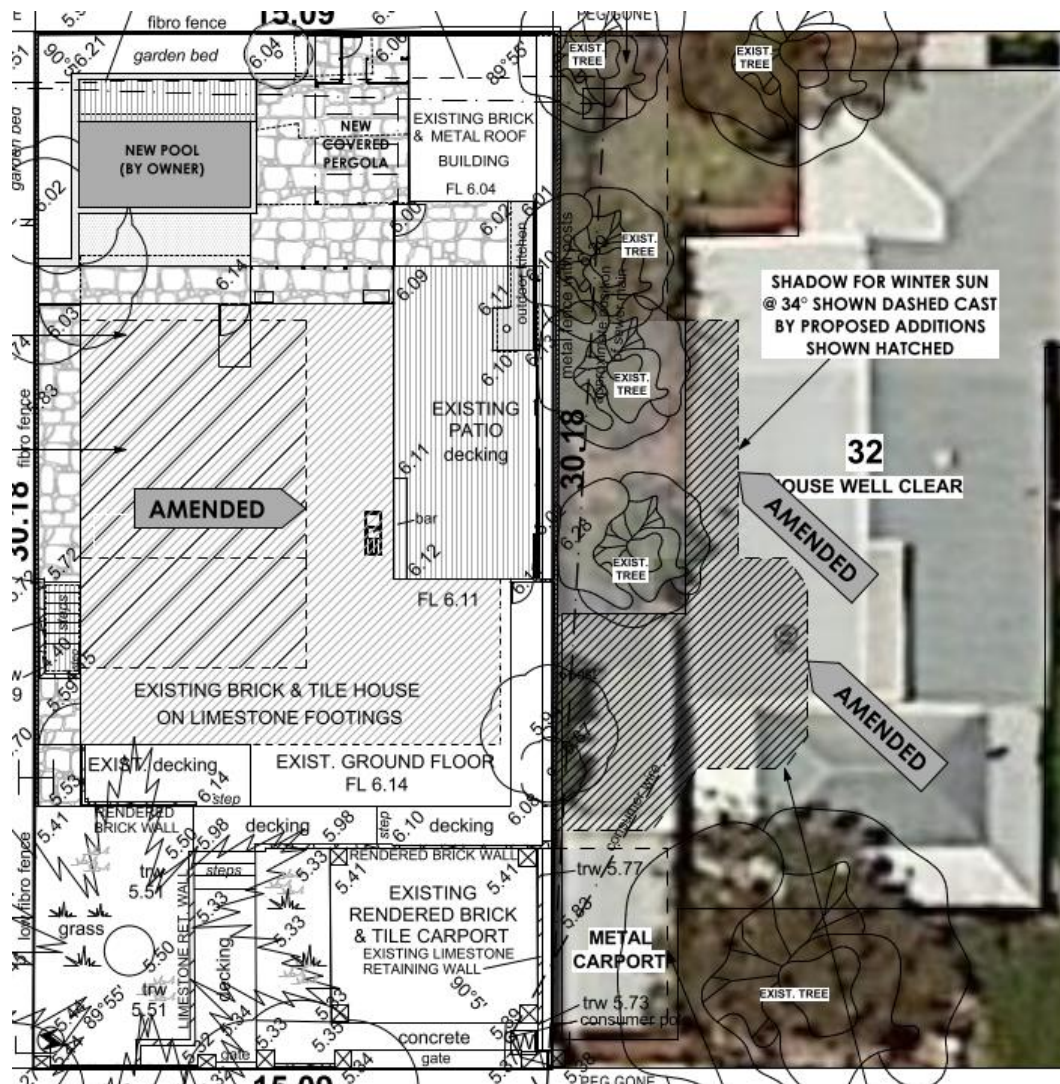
Amended Plans Overshadowing Assessment, plans dated 3 March 2023.
